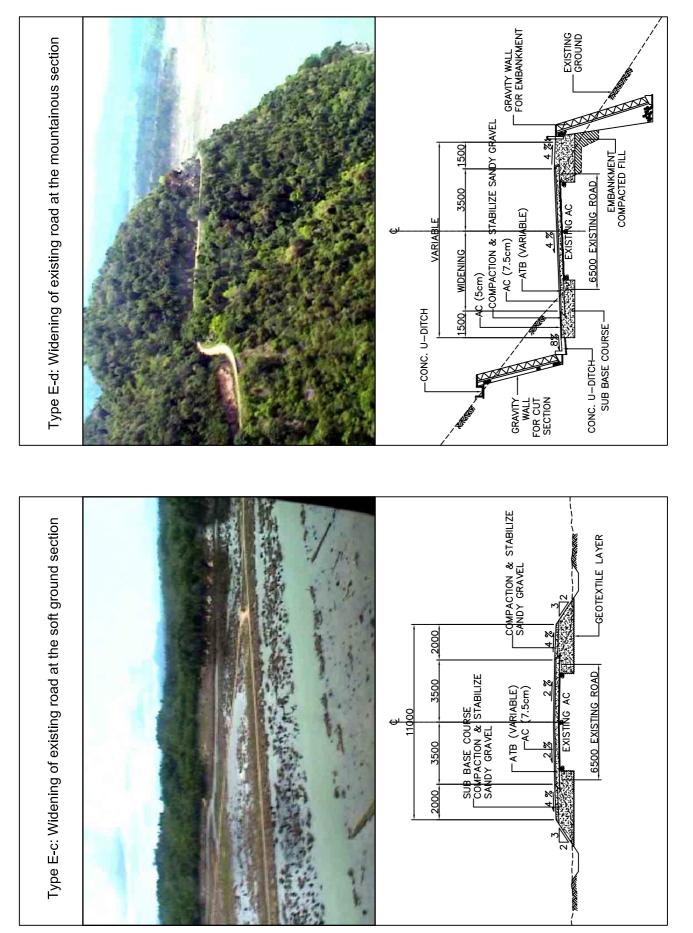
(2/5) TYPICAL CROSS SECTIONS
